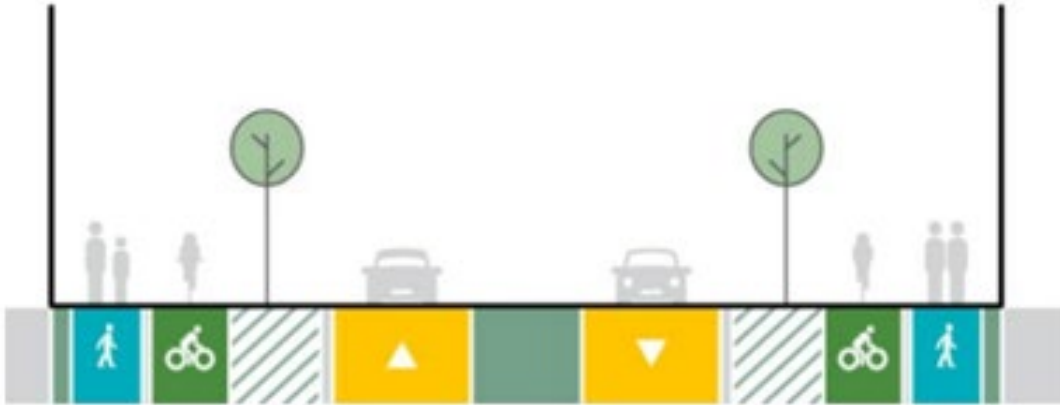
Indicative cross section arrangement for Notice of Requirement W5 – Hobsonville Road FTN Upgrade
